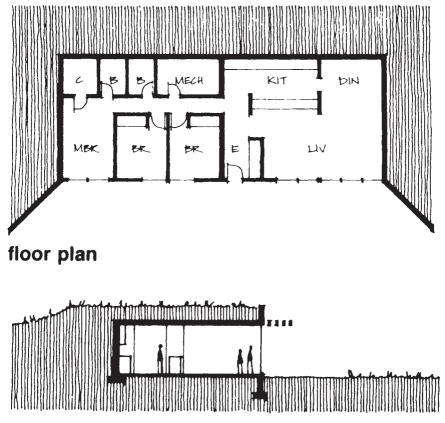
Elevational plan and section. (McGraw-Hill, Inc.)
